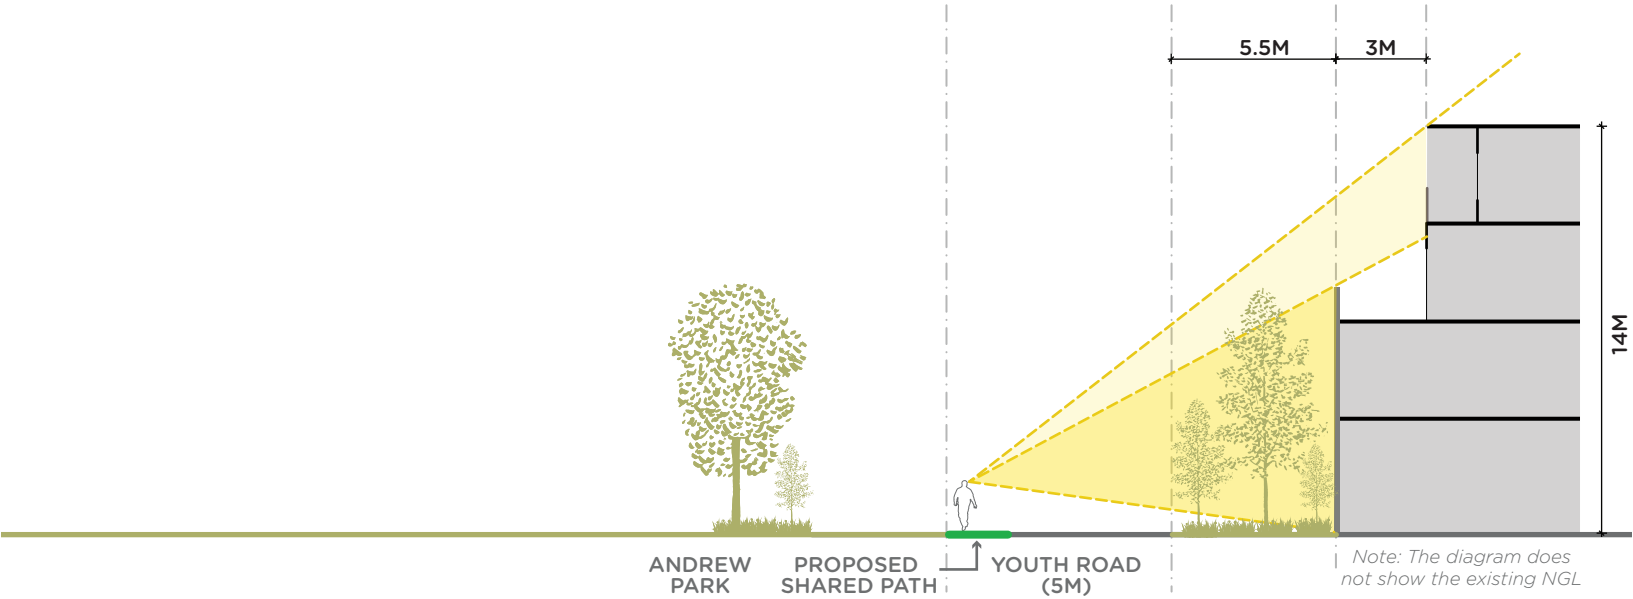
Indicative minimum setbacks at Youth Road in precinct 3 (Section C-C)
